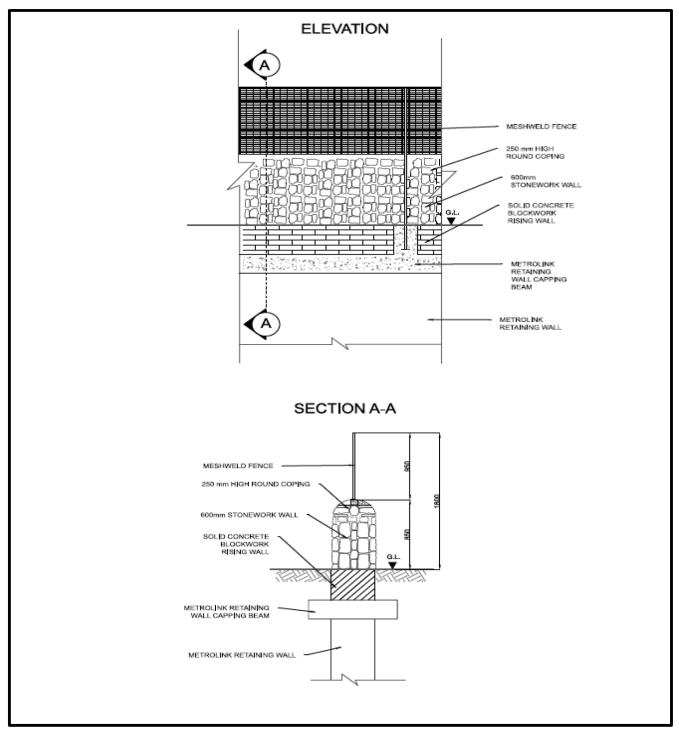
Typical detail of the proposed stonework wall between Ward River and the MetroLink scheme (Ch. 1+ 875 – Ch. 2 + 200)
